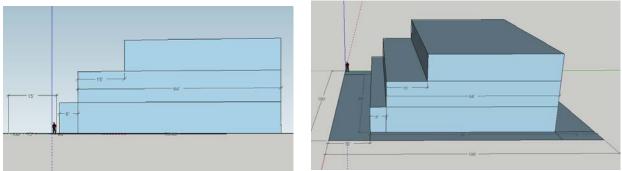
&3: Example of 15 stepback on top floor in 3 story building
